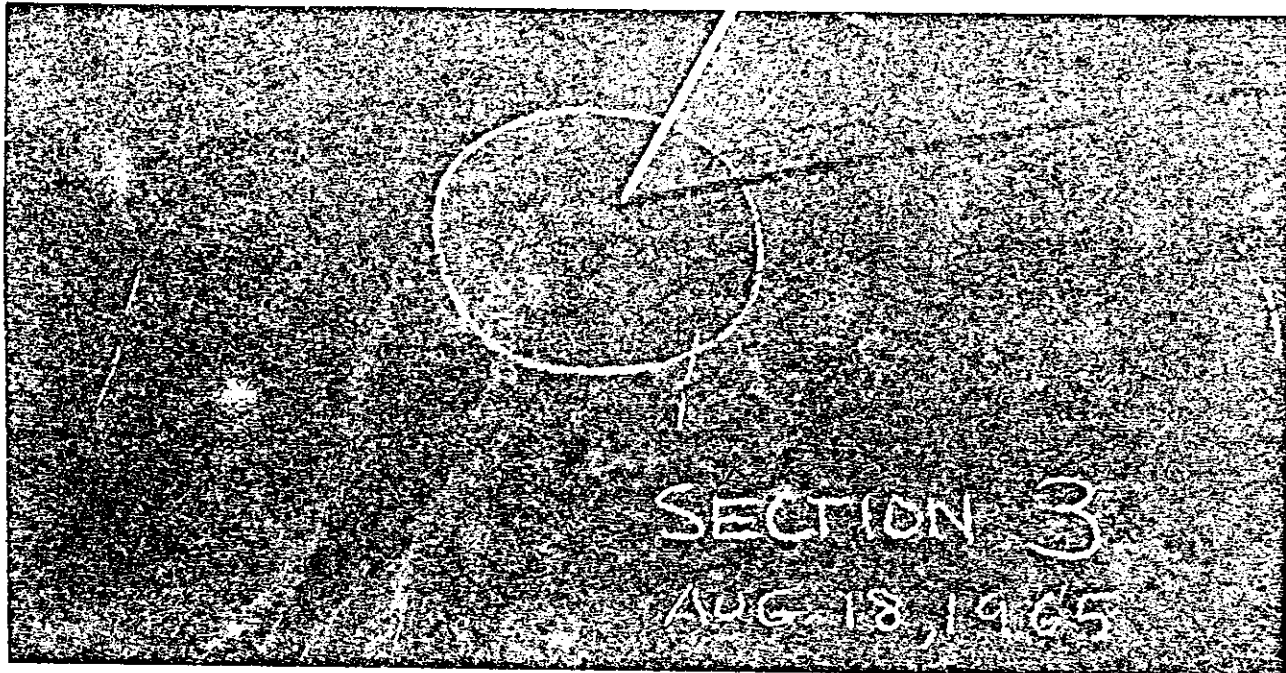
SECTION 3 WITH THE CLASS E ASPHALT-TREATED BASE, SHOWING THE CRACK DEVELOPING AFTER 2,868,000 LOADS. NOTE THE LIGHT COLORED PAVEMENT. THIS SHOWS THE DRIED SILT ON THE PAVEMENT.
